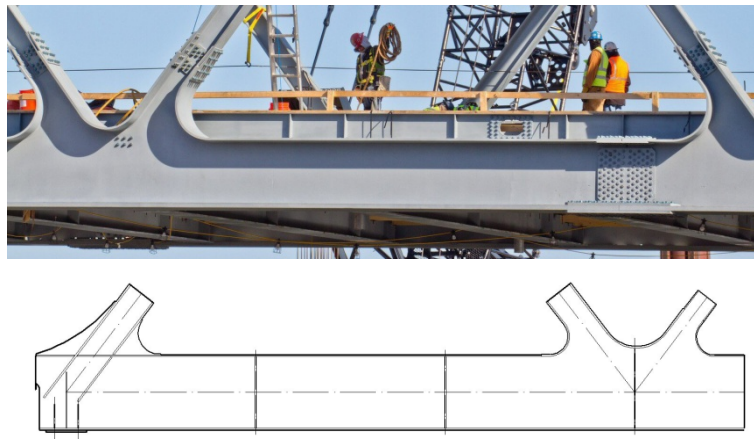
Bottom flange of a gussetless bridge truss girder (top) and an example of assembly part (bottom)
